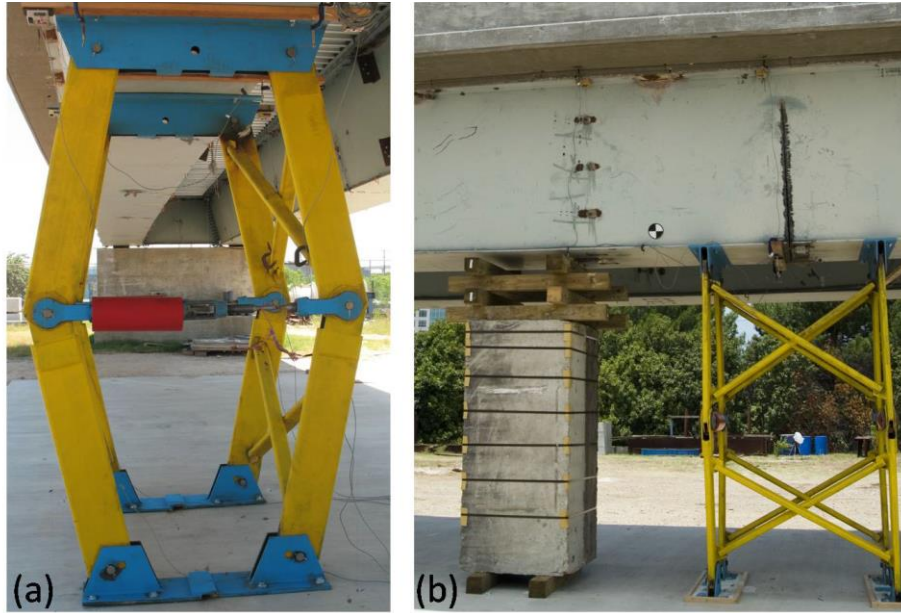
Test-2 details of the UT Tub Girder Bridge from Neuman (2009) [3]
